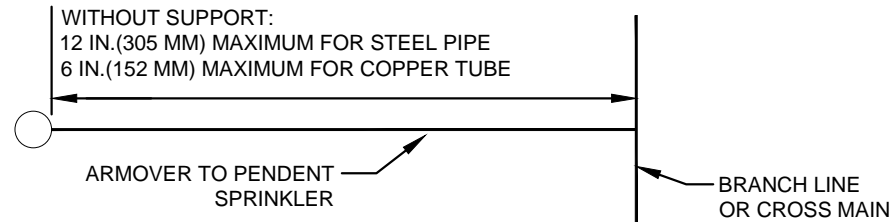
(A) DISTANCE FROM SPRINKLER TO HANGER WHERE MAXIMUM PRESSURE EXCEEDS 100 PSI(6.9 BAR) AND BRANCH LINE ABOVE CEILING SUPPLIES PENDENT SPRINKLERS BELOW CEILING.
